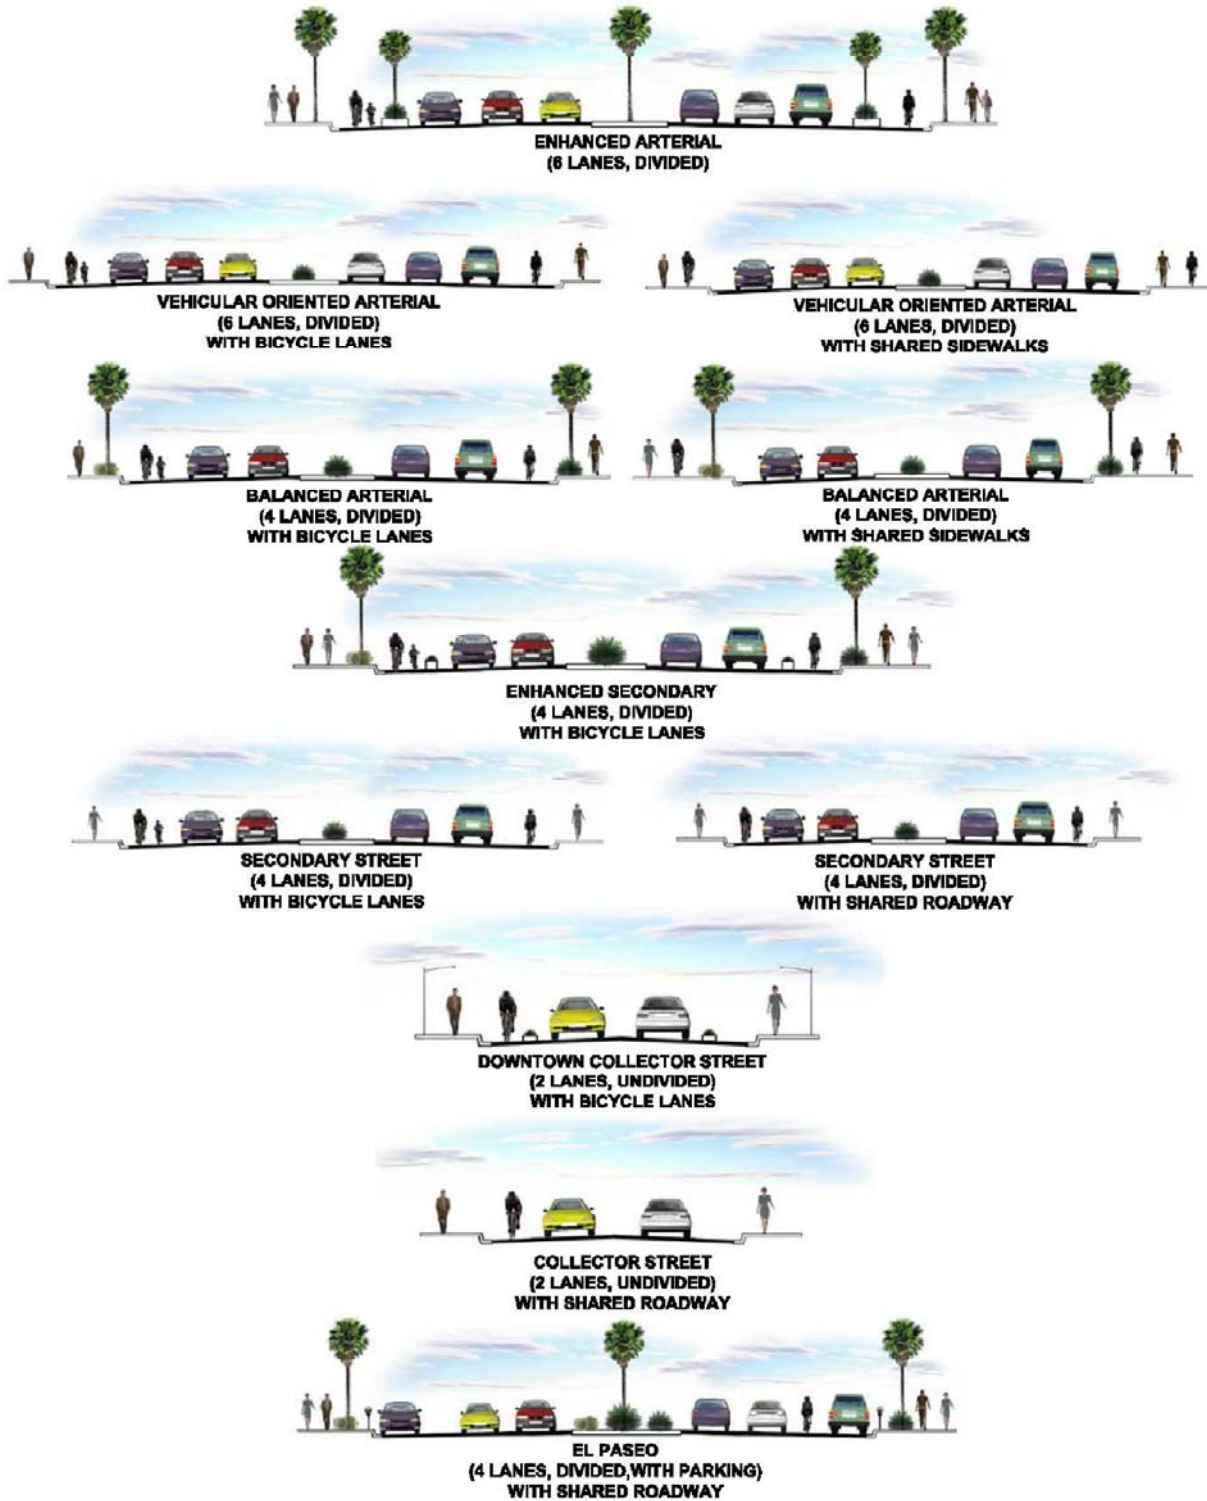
CITY OF PALM DESERT GENERAL PLAN ROADWAY CROSS-SECTIONS
